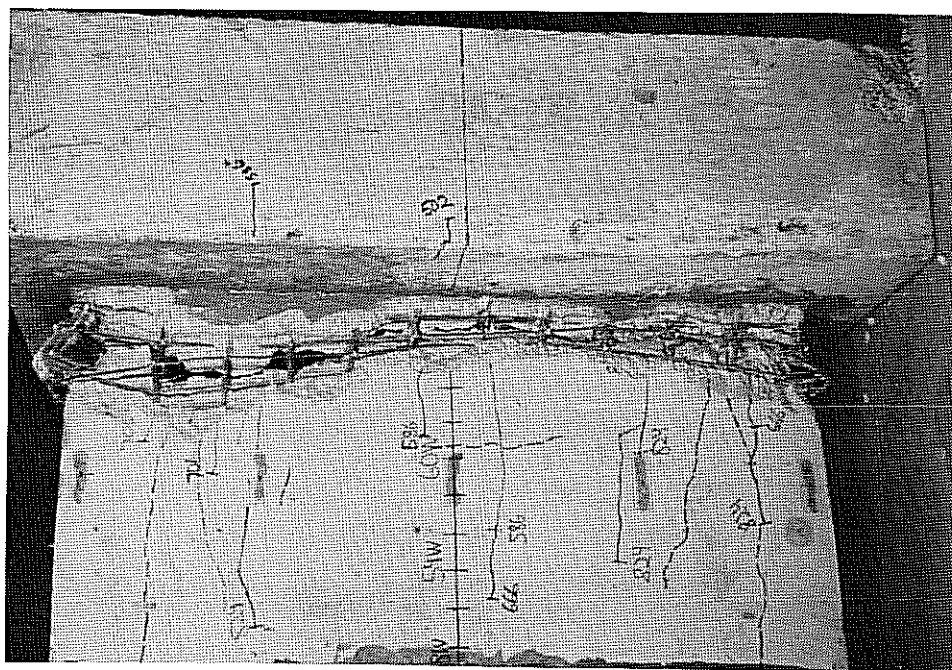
Specimen 6S16 Compression Flange Close-Up
